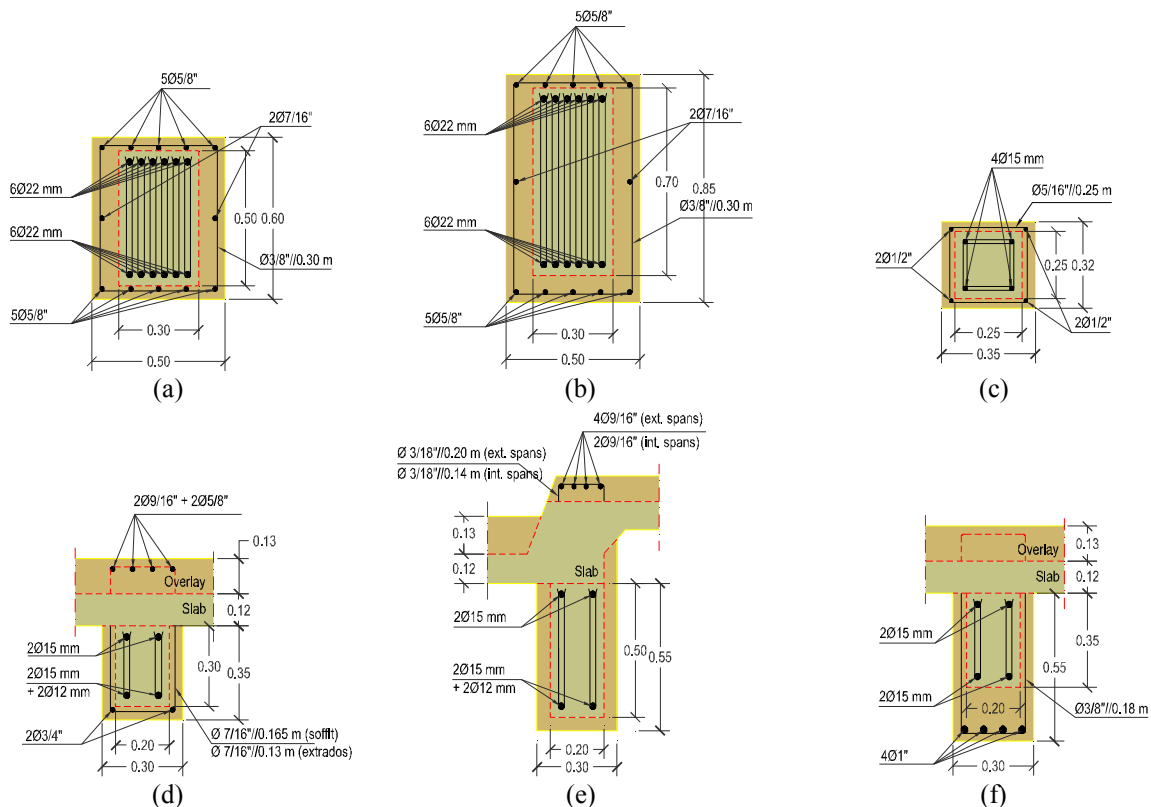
Current cross-section geometry versus original one of different structural elements: (a) arches at the mid span; (b) arches at the abutments; (c) columns; (d) intermediate longitudinal girder; (e) lateral longitudinal girders; (f) transverse girders.
